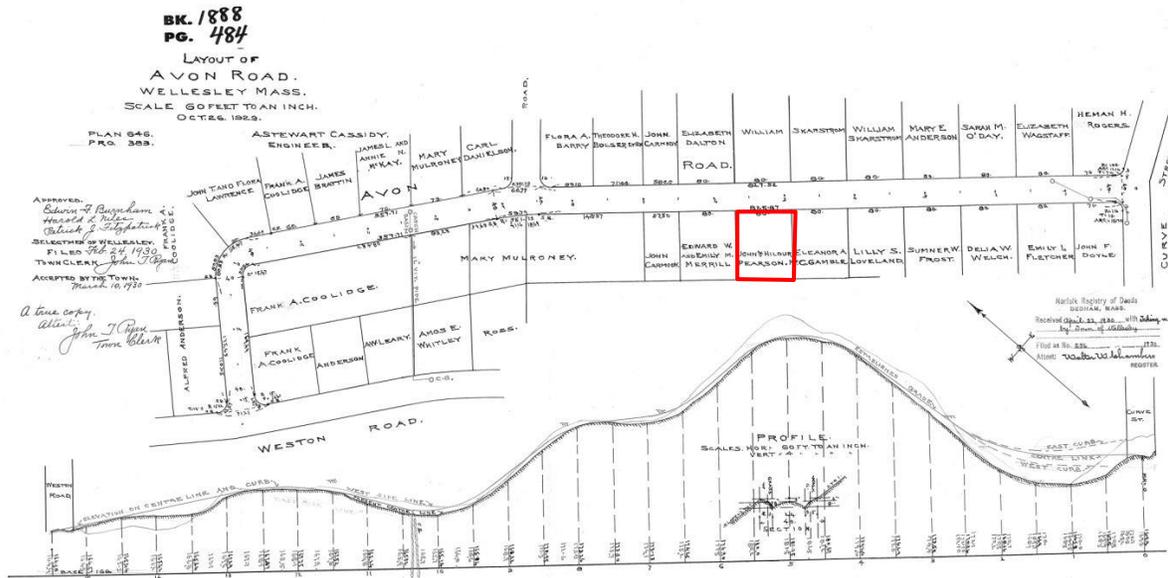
Layout of Avon Road Plan, 1929. Courtesy of Norfolk County Registry of Deeds
